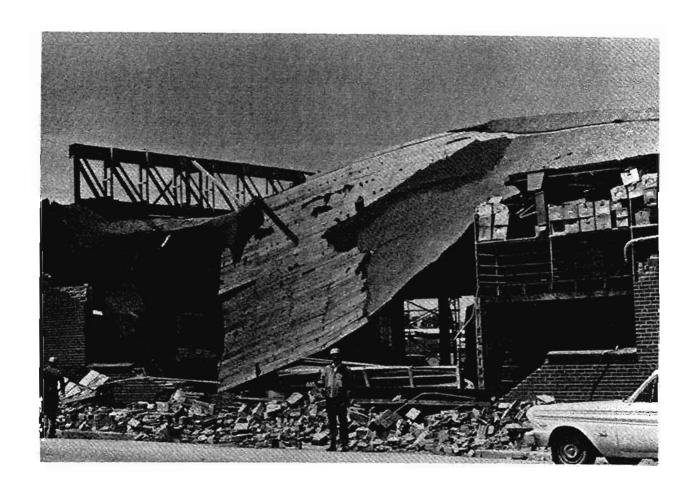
BUILDINGS COMPOSED OF STEEL, WOOD, AND MASONRY ARE OFTEN "MARGINALLY ENGINEERED." Hybrids such as this building in Lubbock are vulnerable to wind damage.
